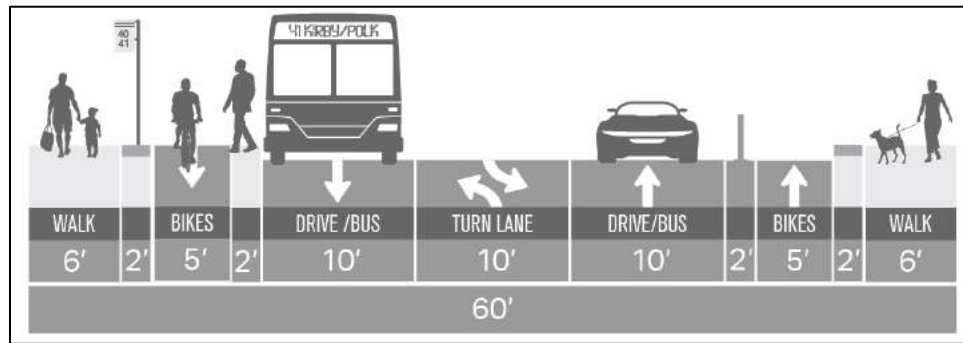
Typical Constrained Bus Stop + Elevated Bike Lane Section
